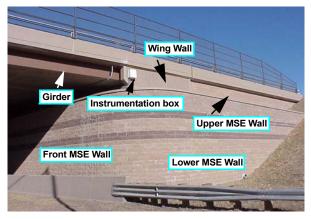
Founders/Meadows geosynthetic-reinforced bridge abutment.
